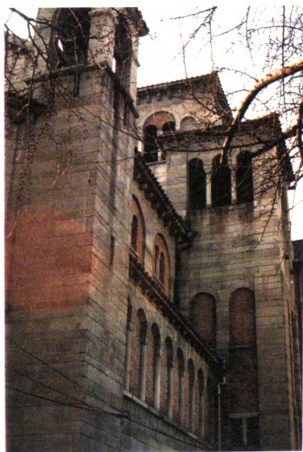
Exterior walls, composite masonry, granite veneer and brick.
